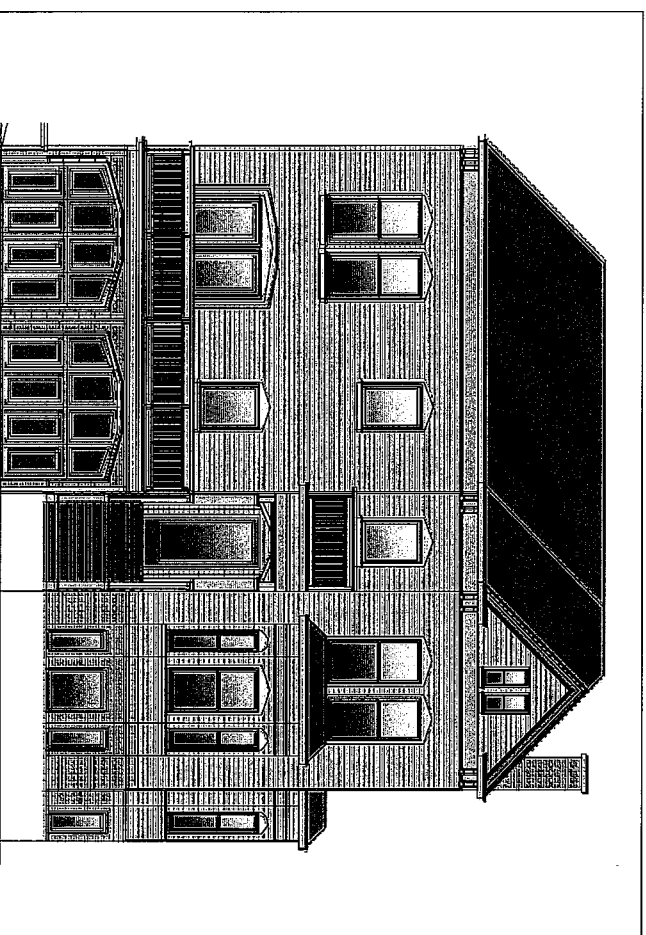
Option A: N. 2nd Street Elevation of Corner Duplex Unit
